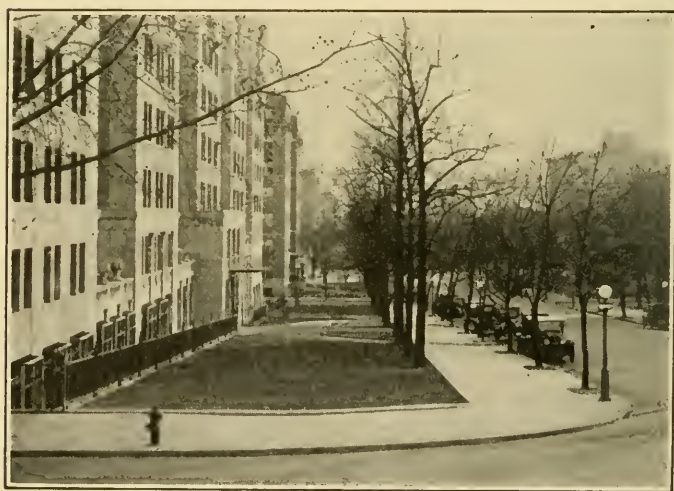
Forty-one feet from curb to building line. A width well adapted to apartment houses and residences bordering a traffic highway.
